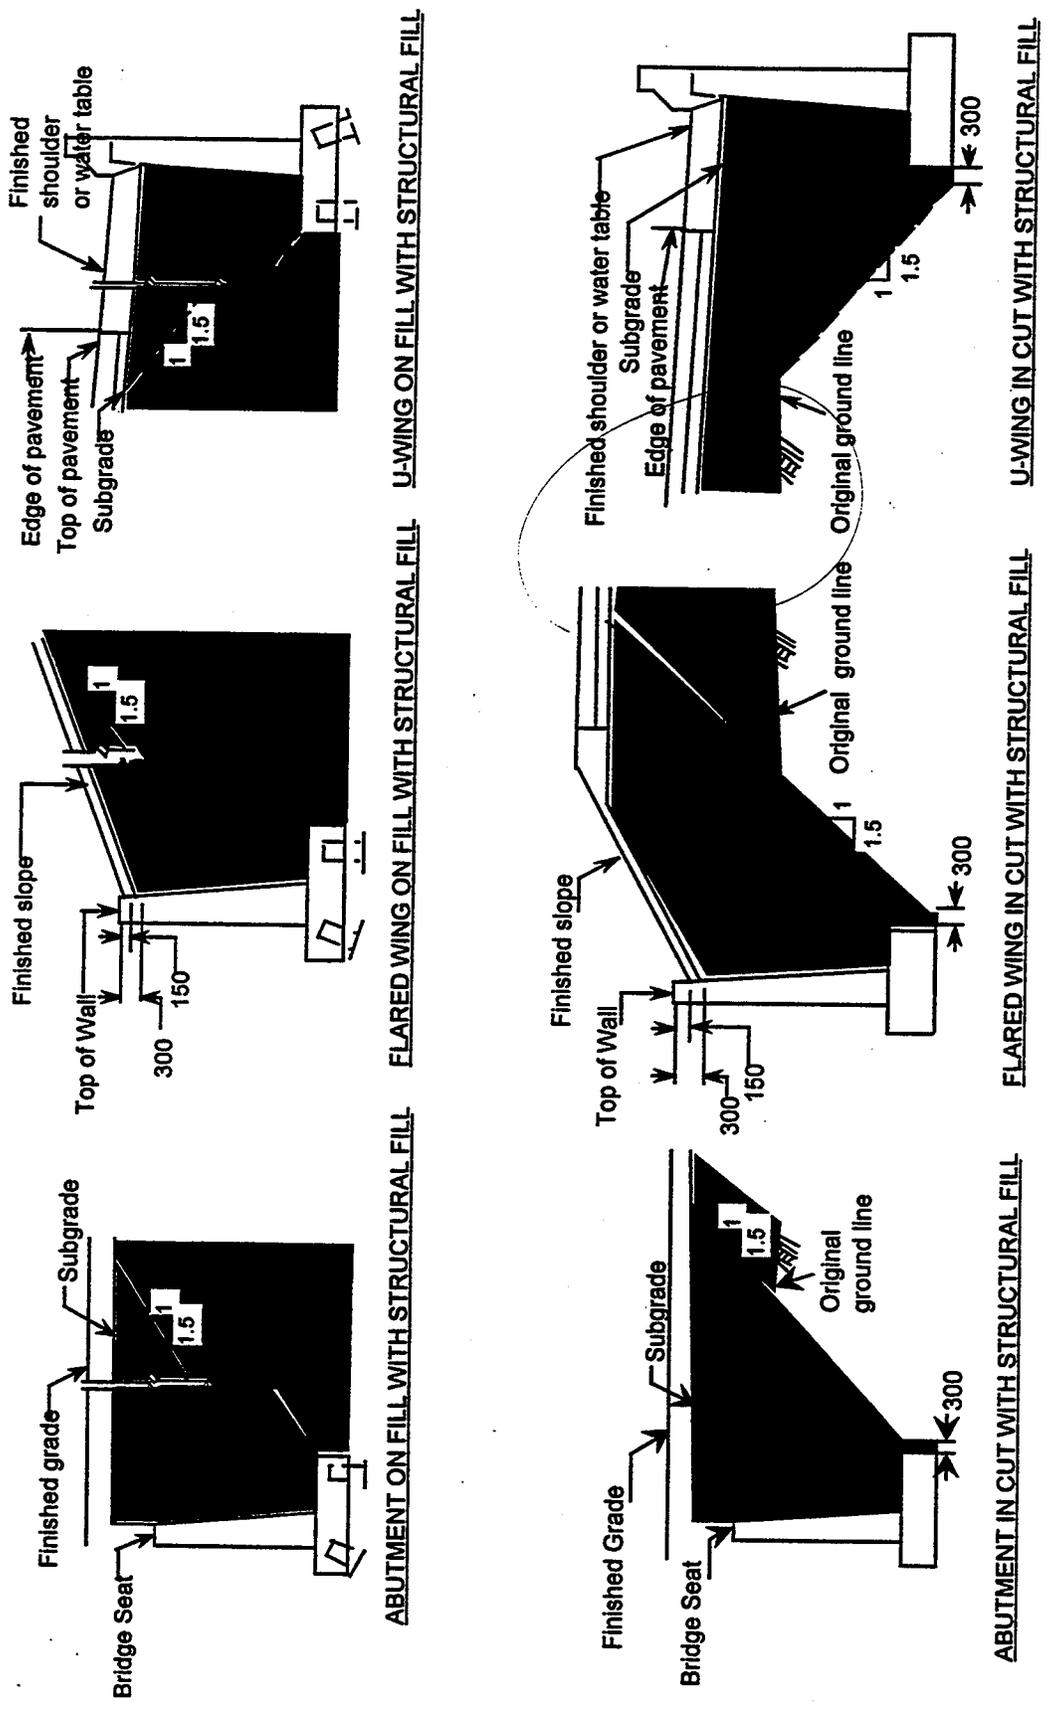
Typical Cross-Sections of Abutments (ref. PennDOT Publication, Section RC-12M).
